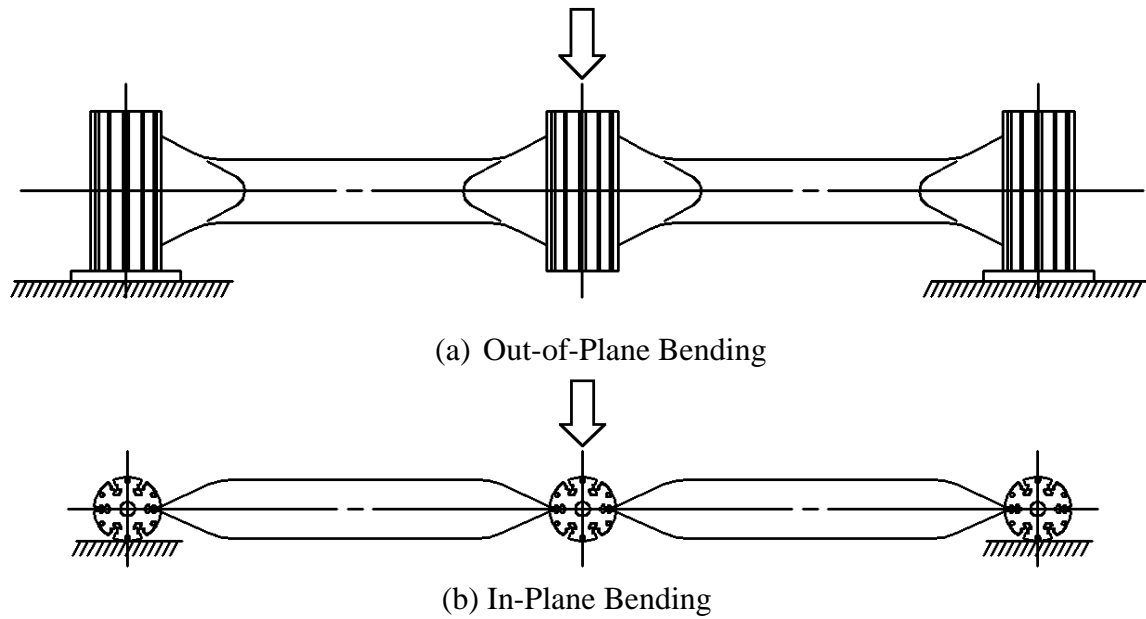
Bending Test Specimen Configurations (After Sugizaki and Kohmura 1994)
